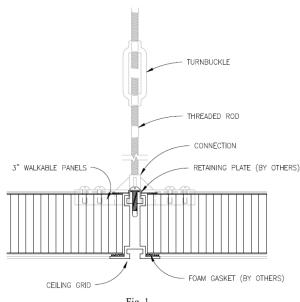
3" Panel Cross Section @ Ceiling Grid
